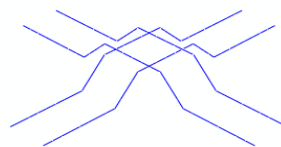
Typical bent bar reinforcement for B-16 slab
